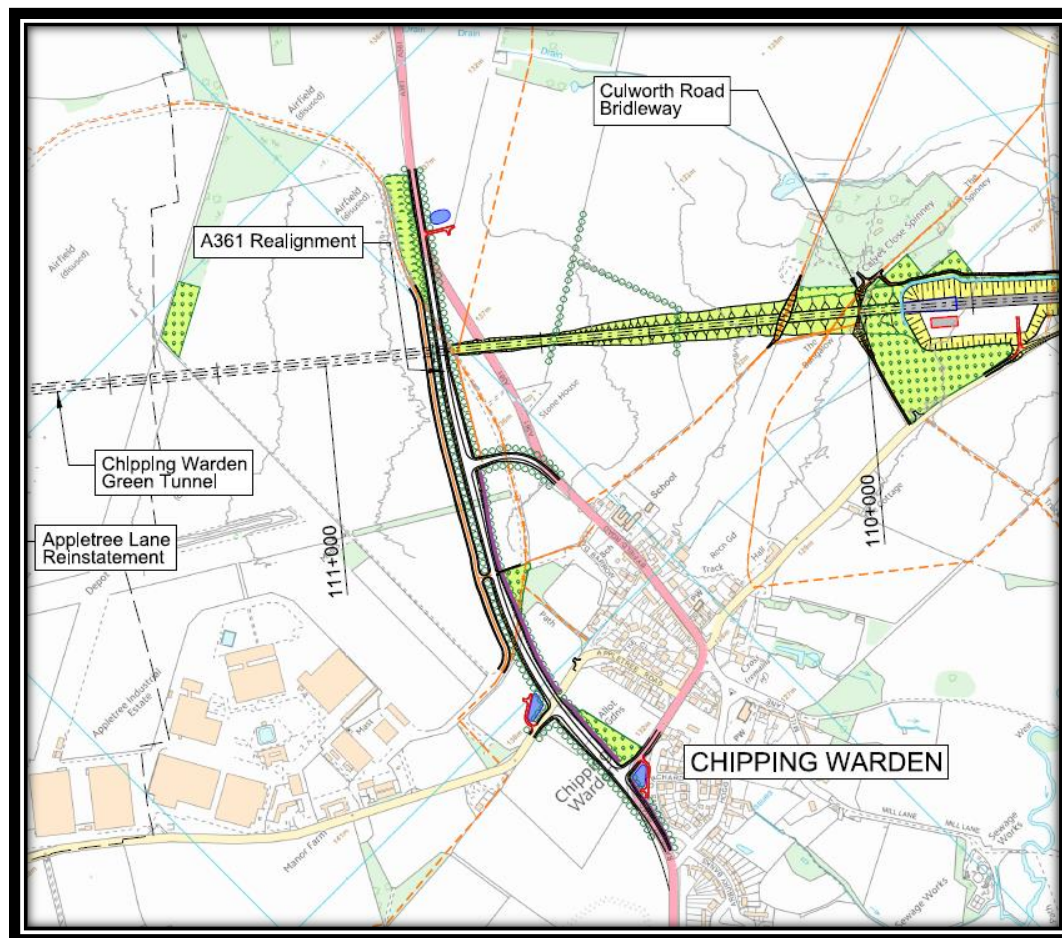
Chipping Warden Relief Road Location Plan (extract from C222-ATK-CV-DPP-020-000014-FPD)
